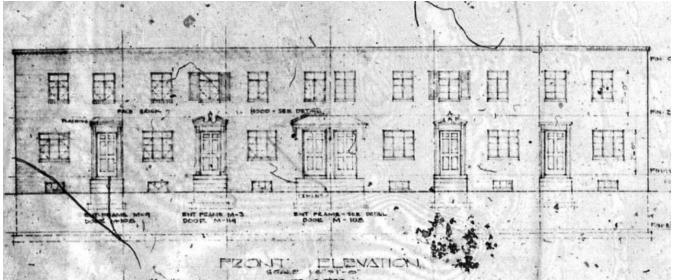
Patrick Henry Homes Block 2 front elevation, Permit #3335. 712 South Alfred second from left.
